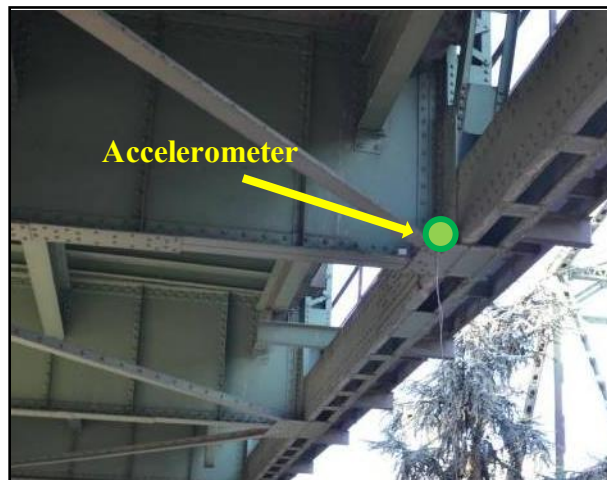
Typical accelerometer installation on a floor girder of Bridge E
